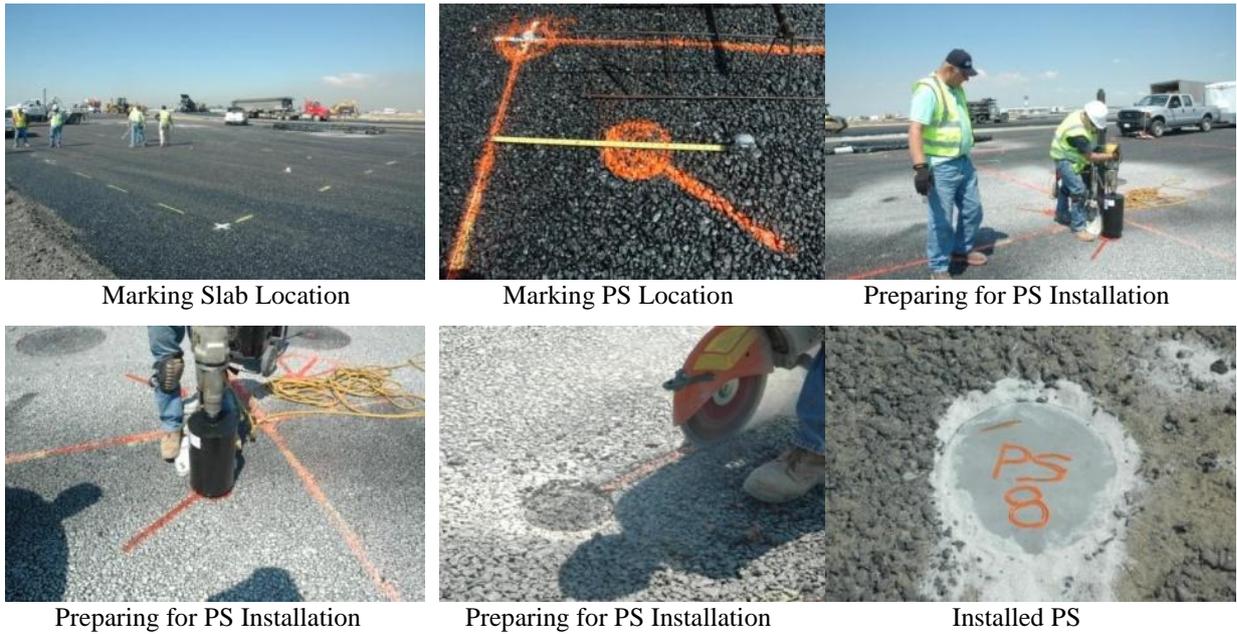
Installation of PS in Taxiway-Z pavement instrumentation project.
